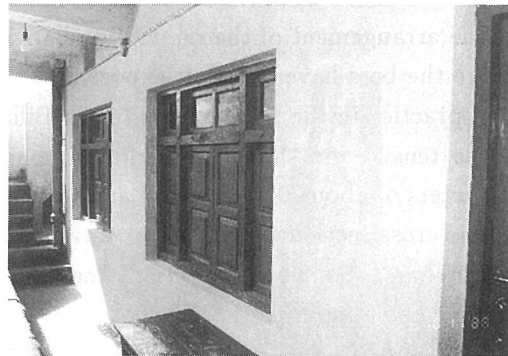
An undamaged reinforced concrete private home, Dhankuta Bazaar, Nepal
